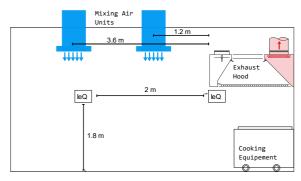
Ventilation, appliances, and sensors layout – mixing air units
